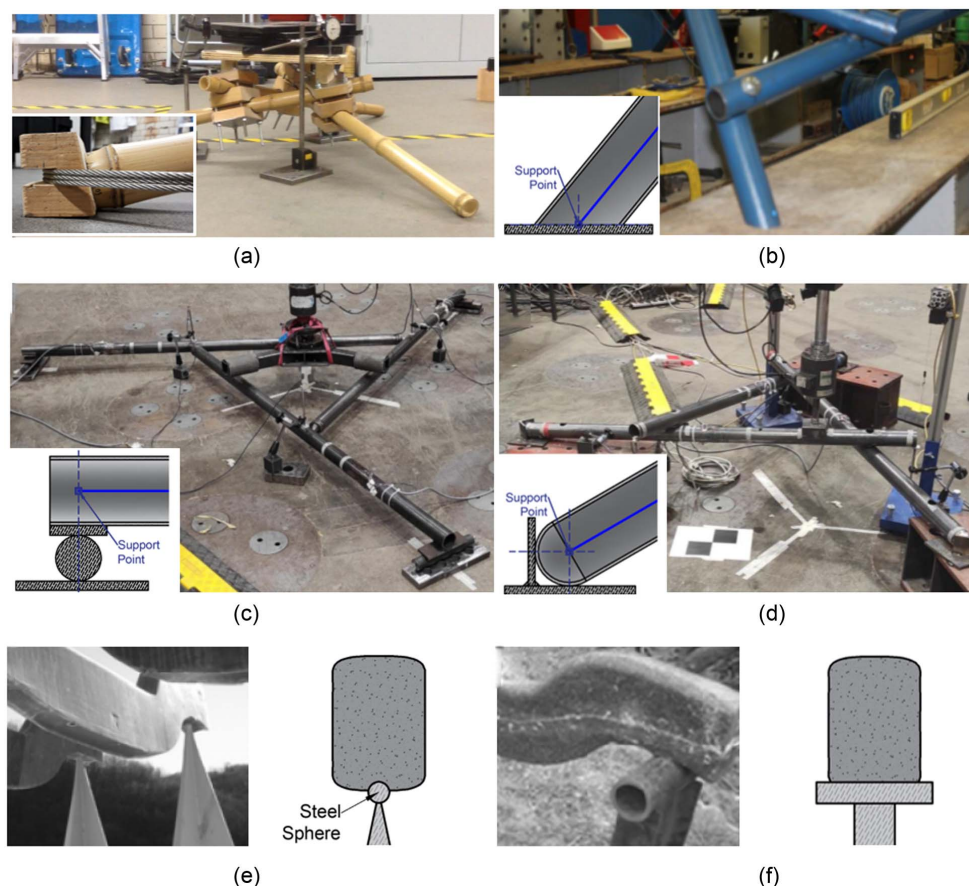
Various supports for experimental RS: (a) support for bamboo RS (images courtesy of Martha Godina Rodríguez); (b) circular tube laid on a horizontal surface (image courtesy of Joseph Rizzuto); (c) tube with welded plate, laid on support roll (image by authors); (d) circular tube with a hemisphere welded at the end (image by authors); (e) concrete beam on fixed sphere; and (f) concrete beam on tube. [Images (e) and (f) courtesy of Attilio Pizzigoni.]
